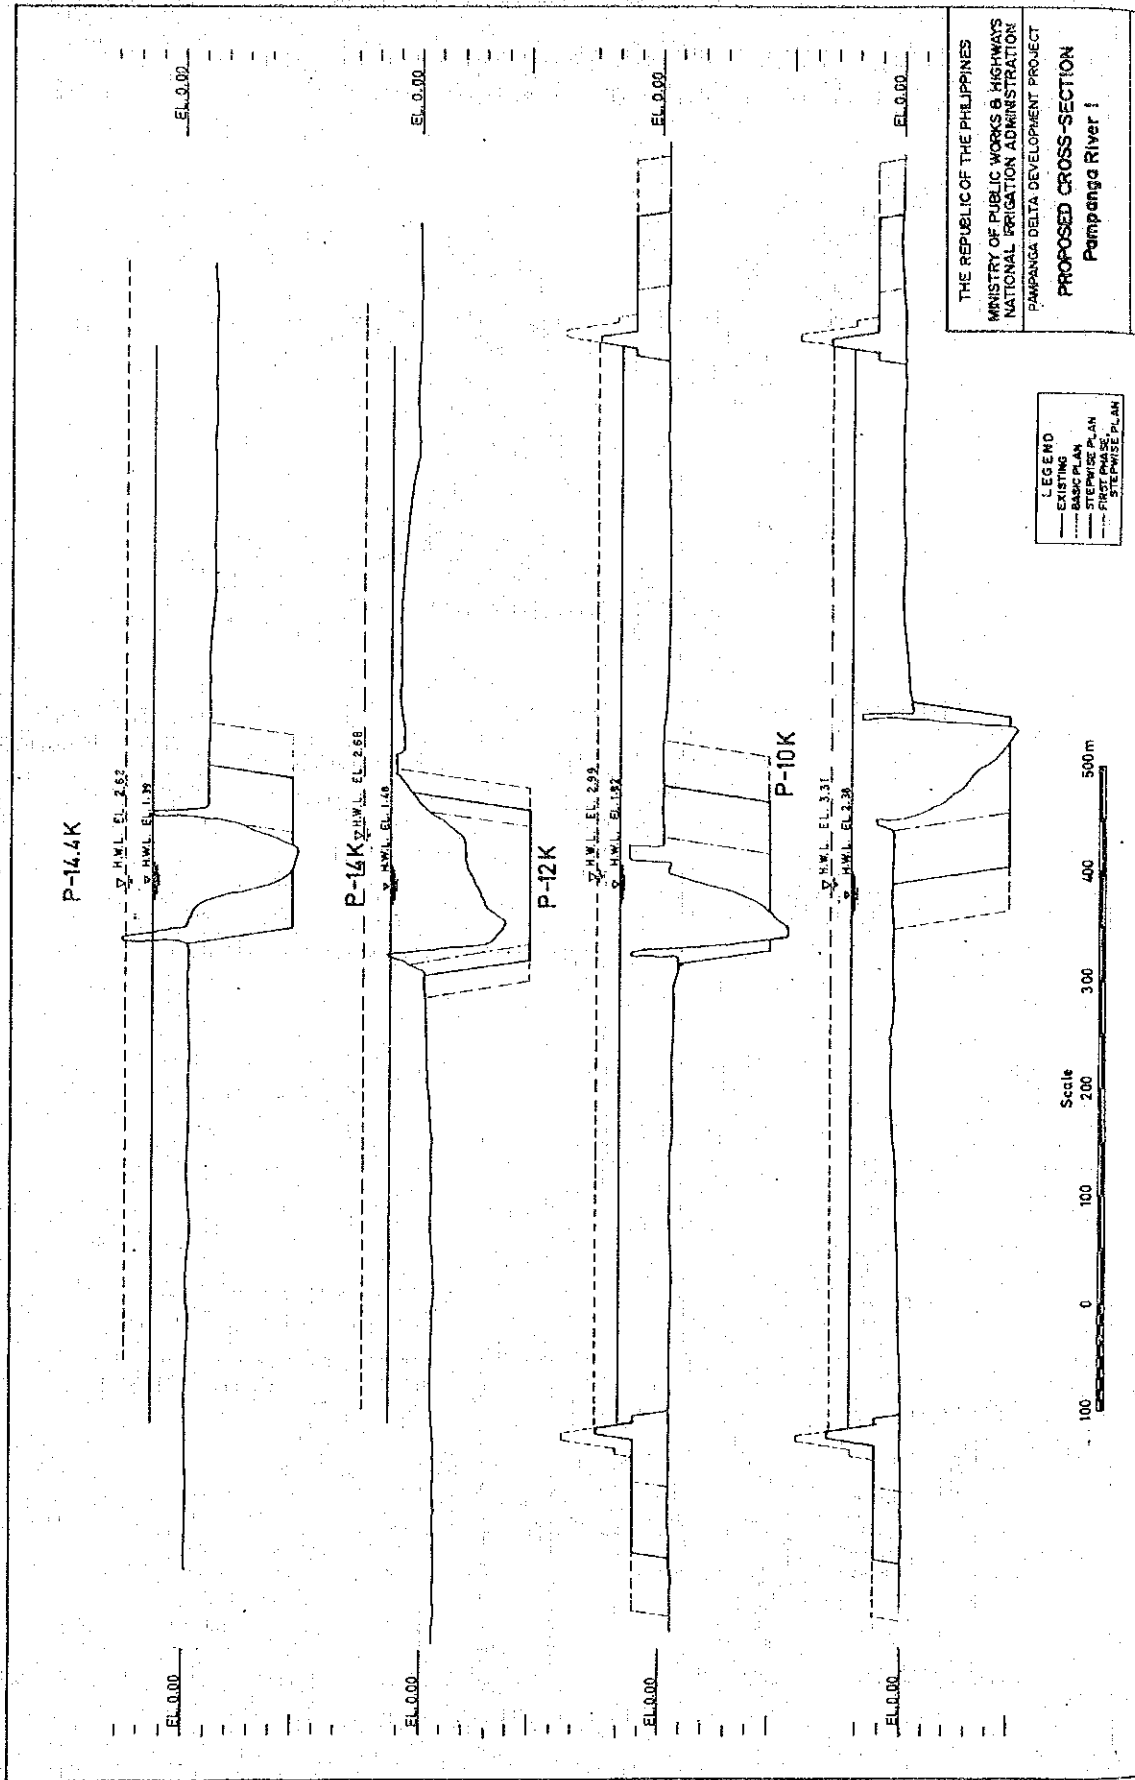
(2) PROPOSED CHANNEL CROSS-SECTION
